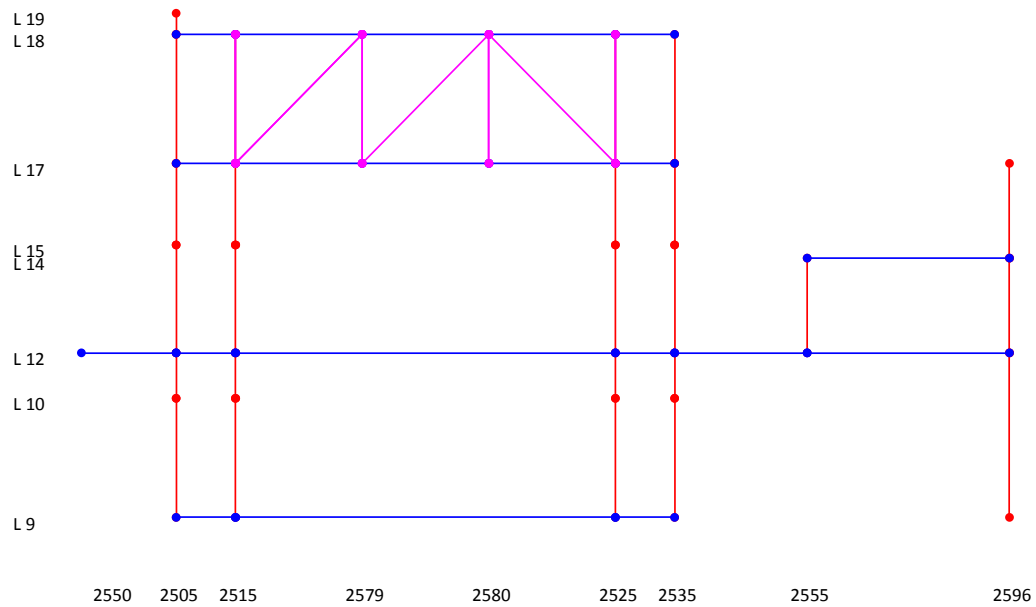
is a section showing structural elements in the N-S direction. This elevation connects column lines 2550 to 2596 (see Figure 4-16). There are ten frames each of four close coupled columns which act as one-way concrete frames in conjunction with the reinforced concrete beams supporting the floor slab. The columns of the two end frames and the central frame (Figure 4-17 is a central frame) cantilever above the suspended level to form a double height space. These columns support the steel roof trusses and a lightweight roof. The intermediate frames extend to the suspended floor (L12 in the model) only.
